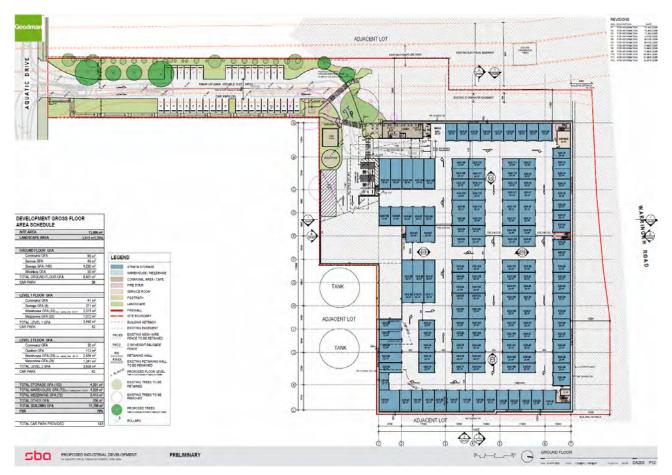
Excerpt from Site Plan / Roof Plan (Dwg. DA200, P12). SBA, 24 April 2025.
